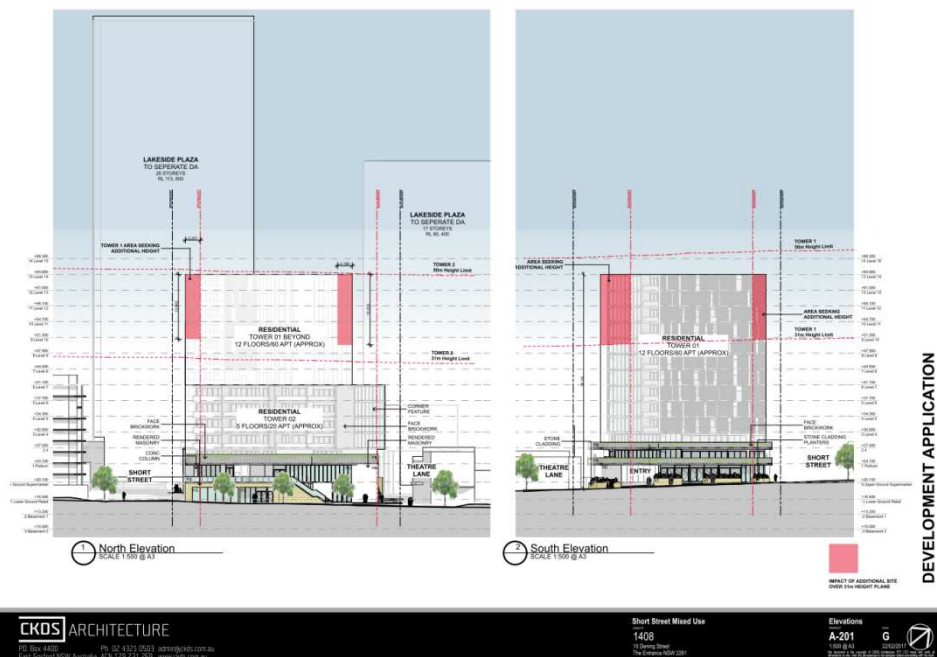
Elevations depicting areas subject to Clause 4.6 request
